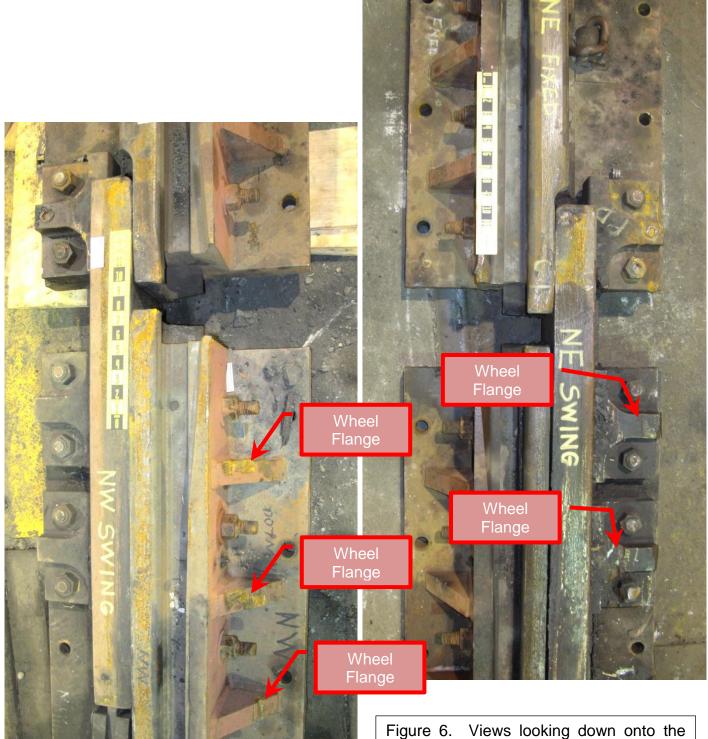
Views looking down onto the west (left) and east (right) locks at the north end of the bridge with wheel flange marks denoted on the gauge side of the west rail and field side of the east rail.
